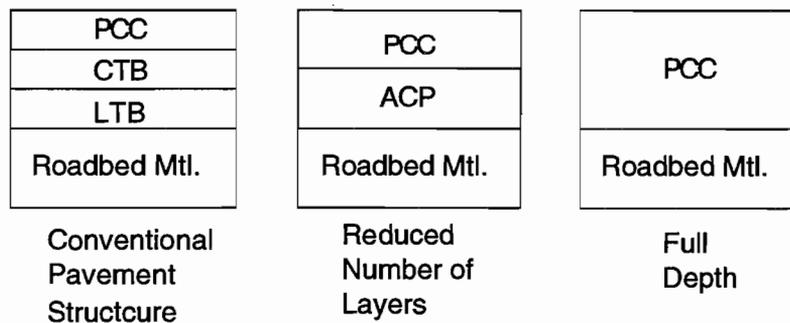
Design of reduced number of layers and full-depth sections to expedite pavement construction (Ref 1)
